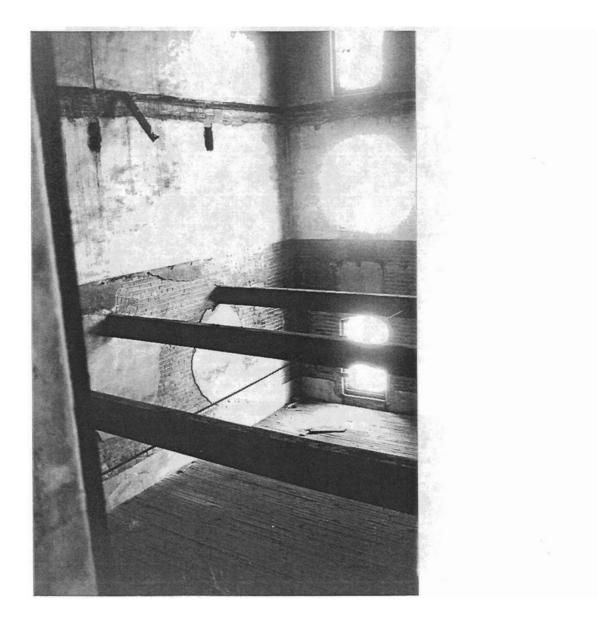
Concrete gutter, curb and drain pipe on west wall of Floor 1. *Source: Historica Research Limited, December, 1993
